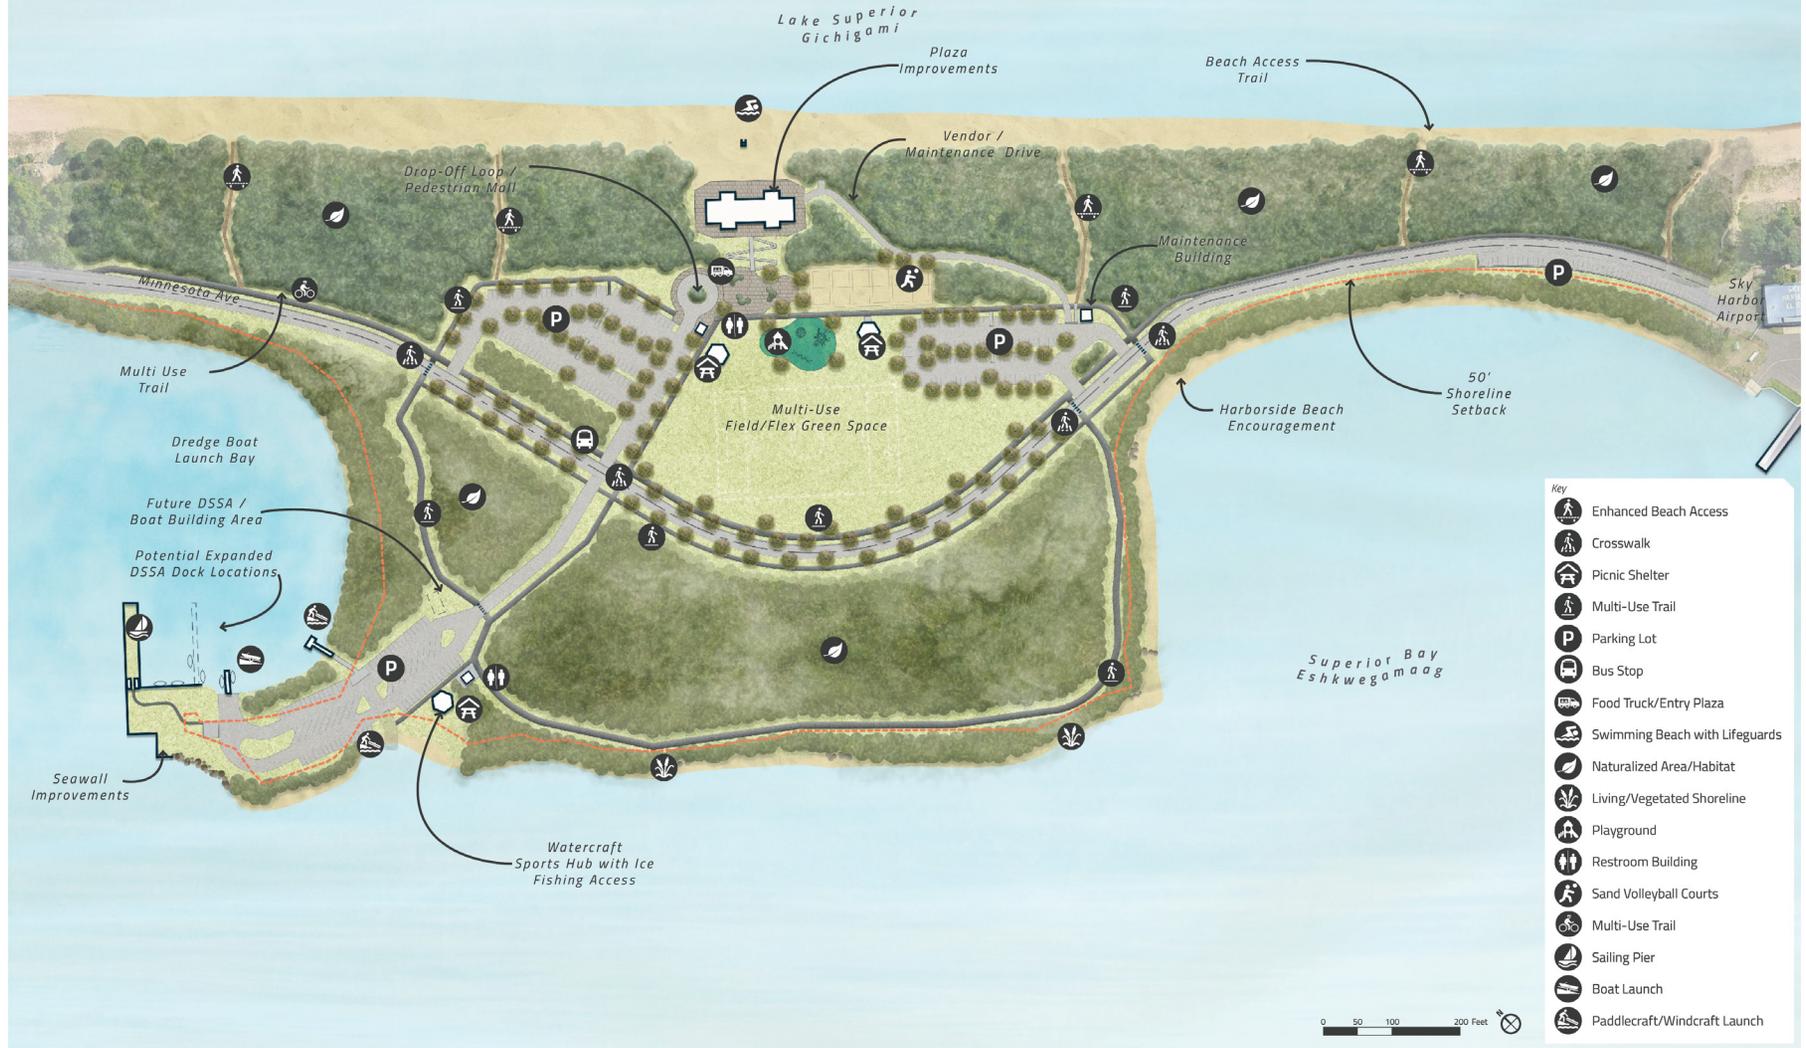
Park Point Rec Area Preferred Concept Plan
